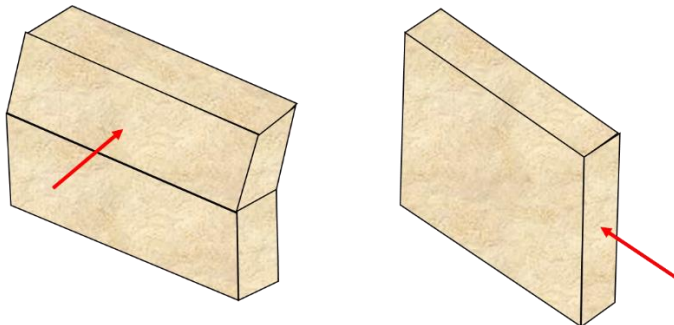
Out-of-plane (left) and in-plane (right) behaviour of a single wall.
